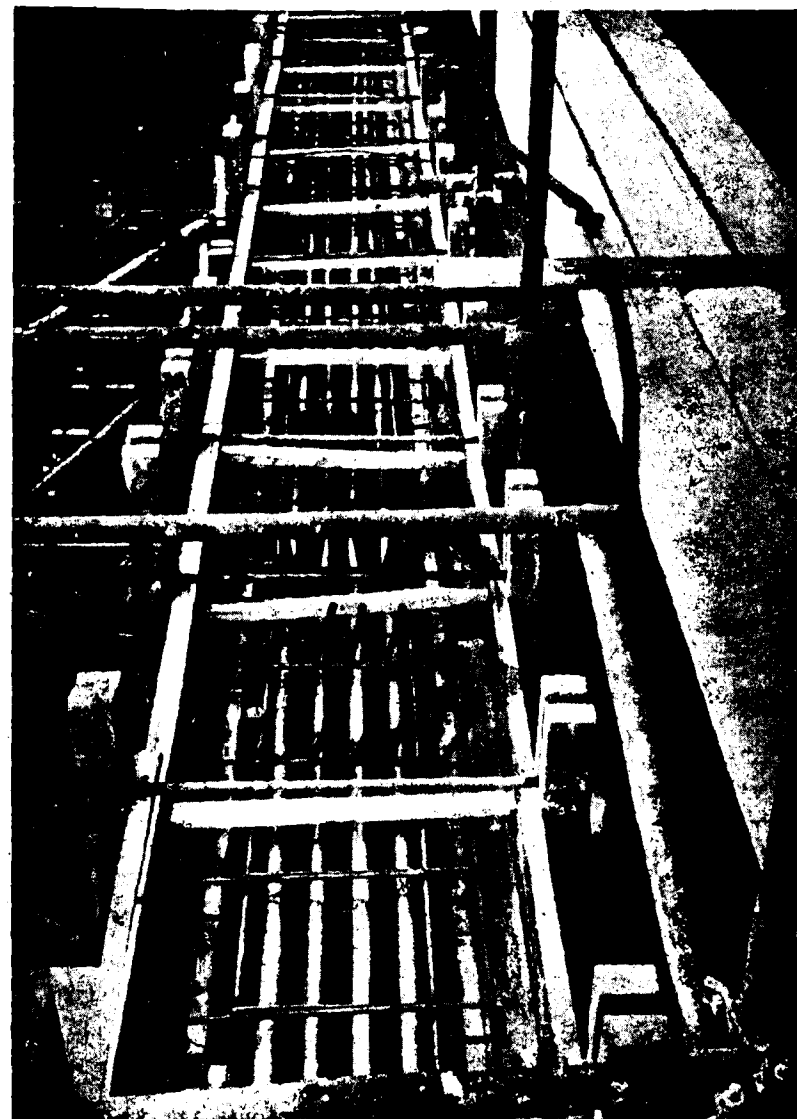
Castle Bridge, Shrewsbury—Cables in cantilever beam on centre line of bridge.
